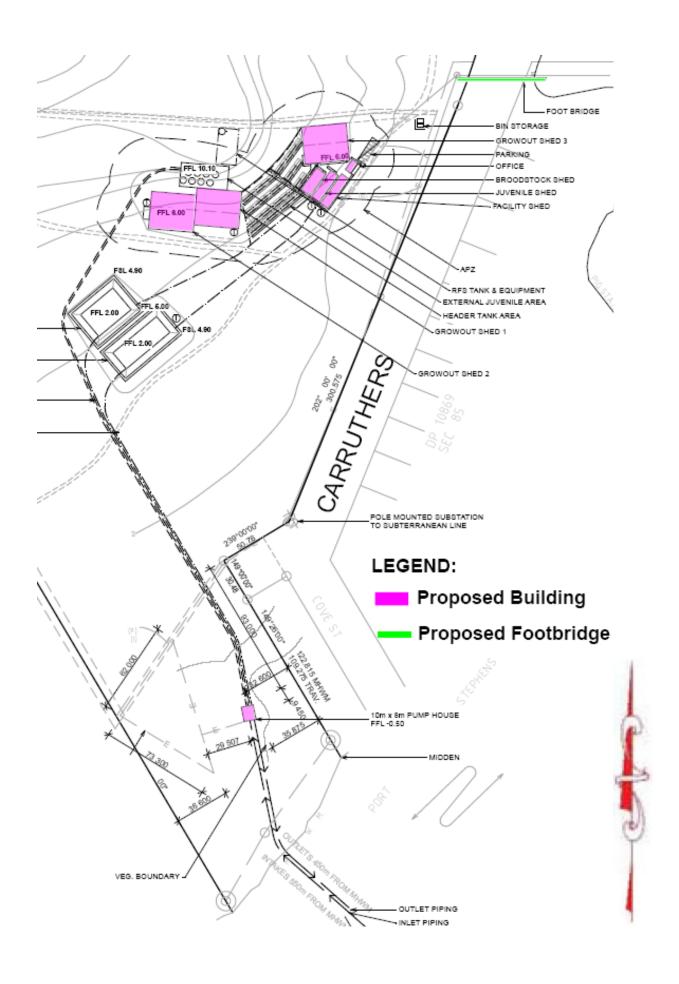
Site Layout Plan of the Pindimar Abalone Farm.
